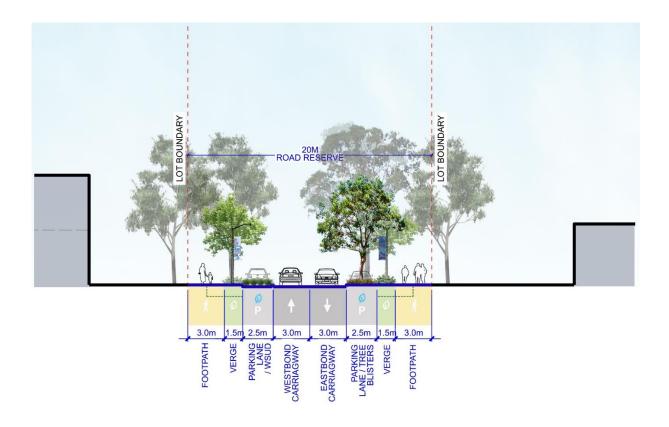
Proposed 20.0m Secondary Circulation Route Typical Cross-Section
